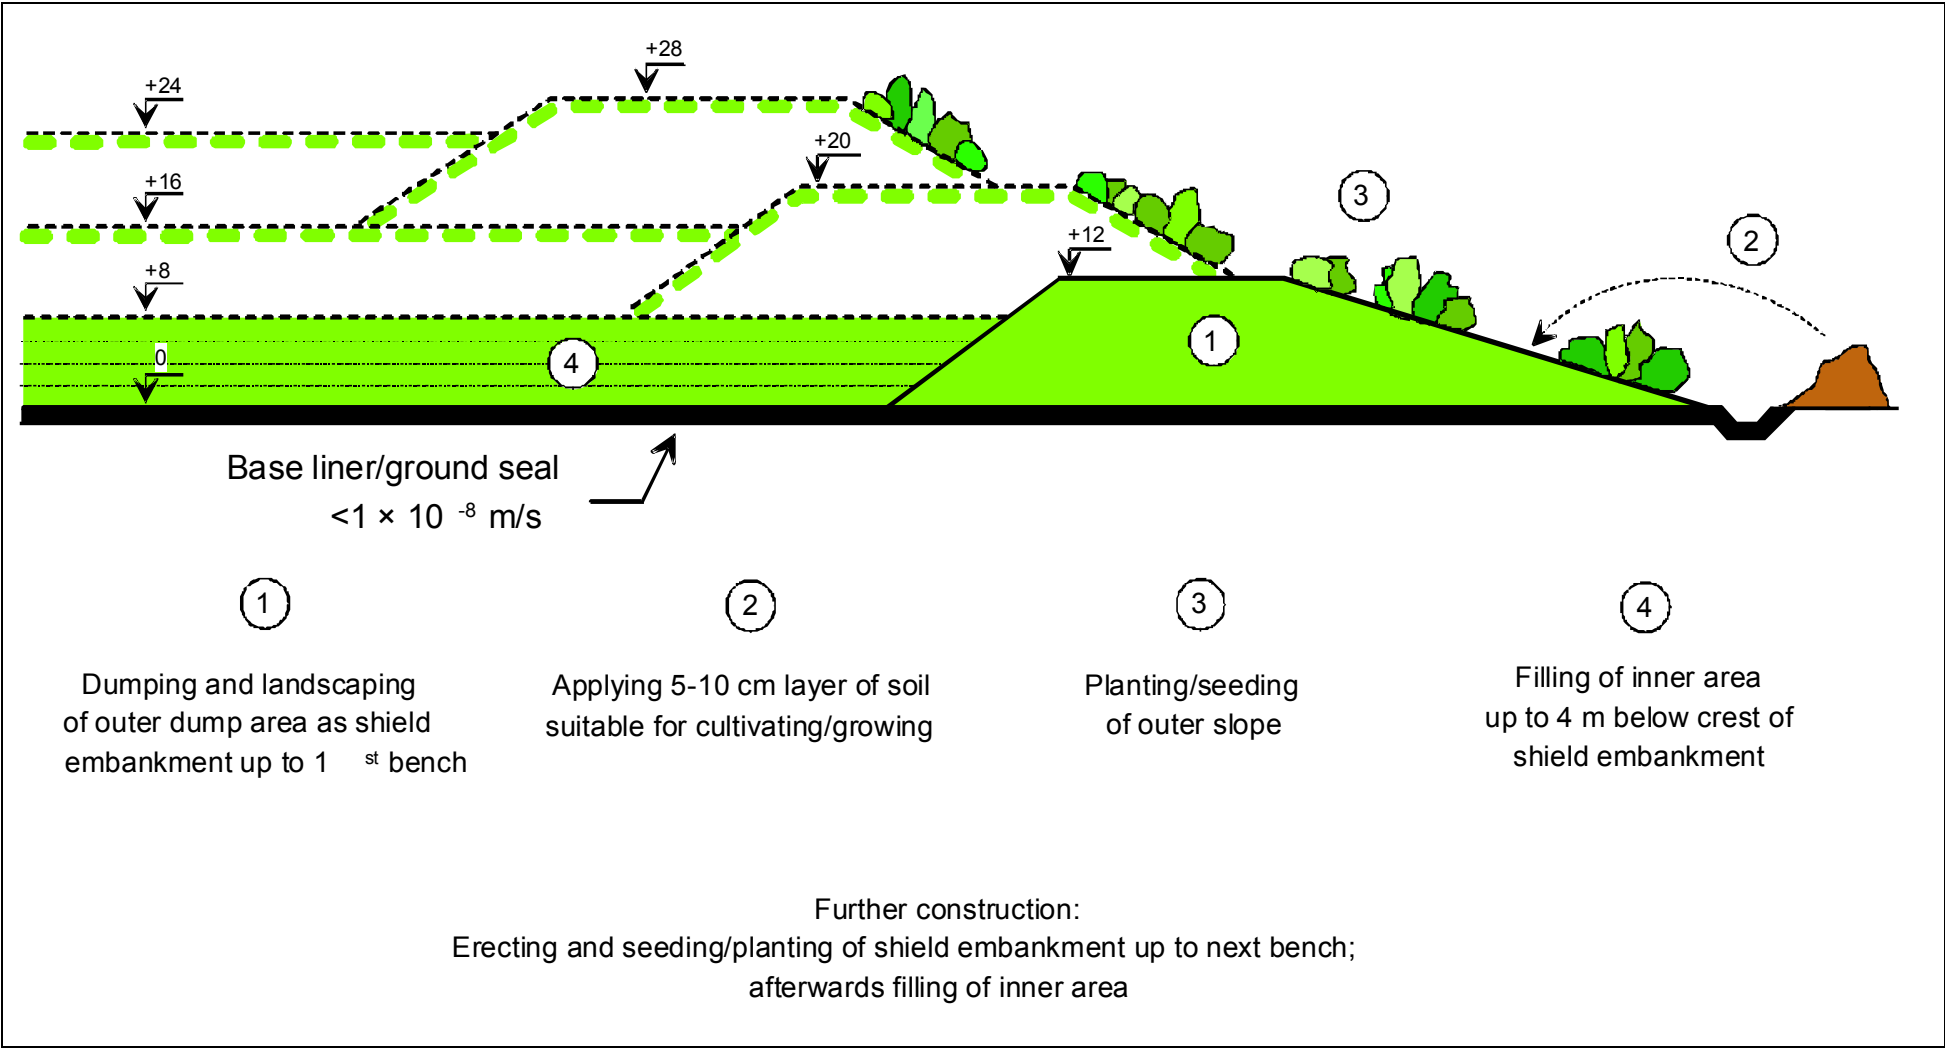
Schematic drawing of tailings heap construction in the Ruhr, Saar and Ibbenbüren areas [79, DSK, 2002]
